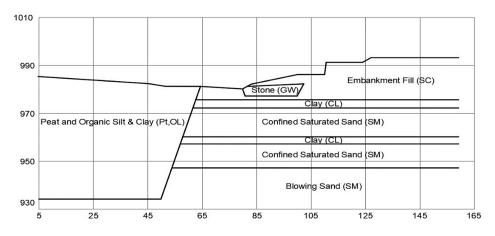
Typical section for Slope Stability Analysis (Adapted from [1])
